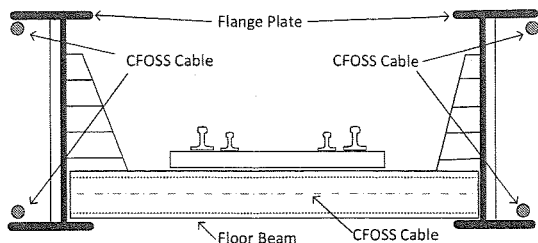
PLATE-GIRDER BRIDGE WITH CFOSS CABLE
